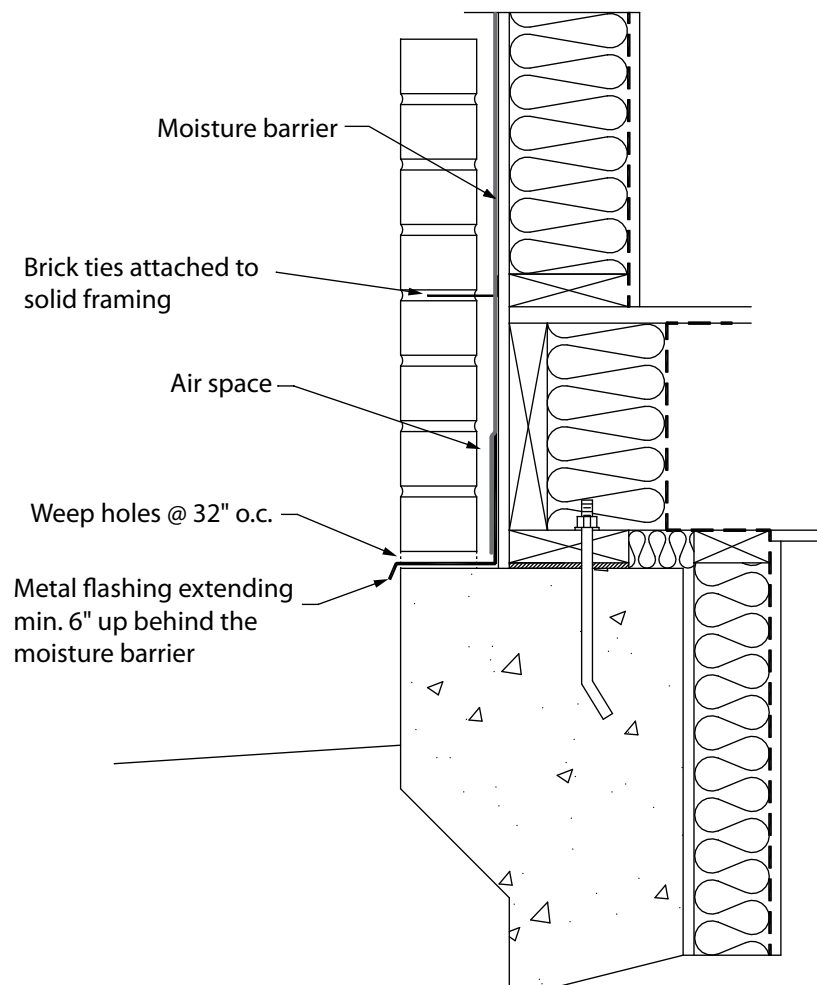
Masonry veneer supported on a corbel in the foundation wall
